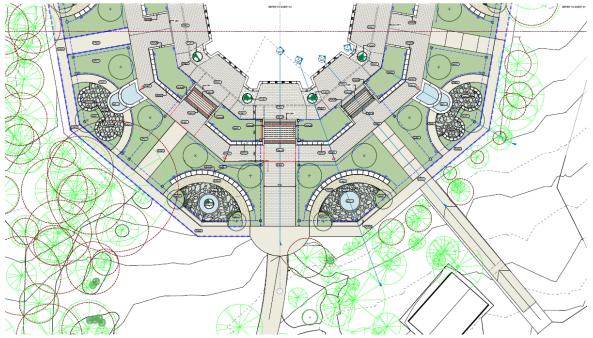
Proposed Finishes Plan Sheet 2. Note: All plantings, paving and water features will be new. Refer to finishes schedule for further information.
